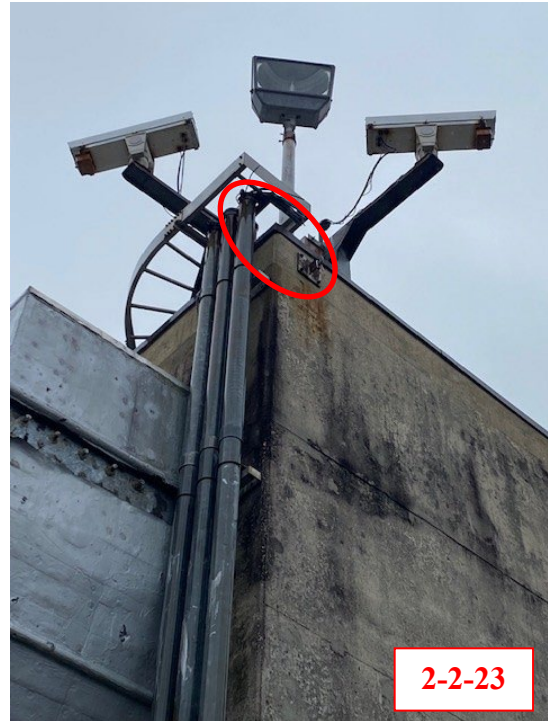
Former Location of Basket and Cables to Northeast Corner of Building 235-F
